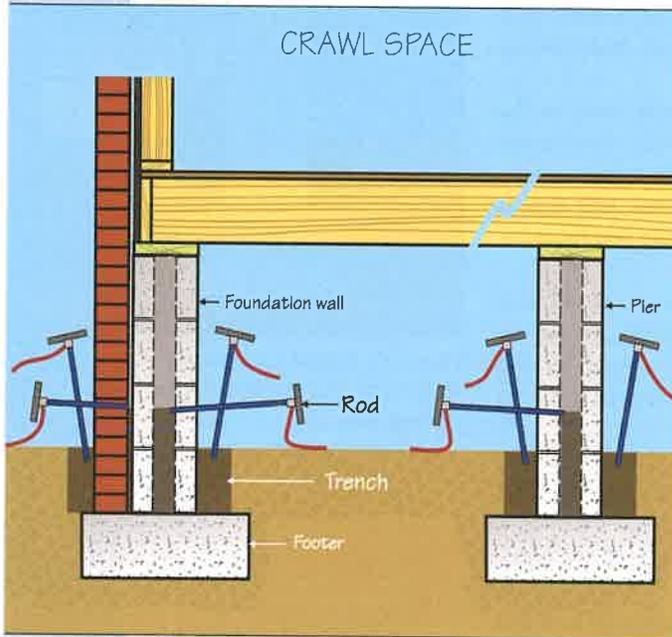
Typical placement of termite treatment, shown as shaded areas, in a crawl space foundation.
